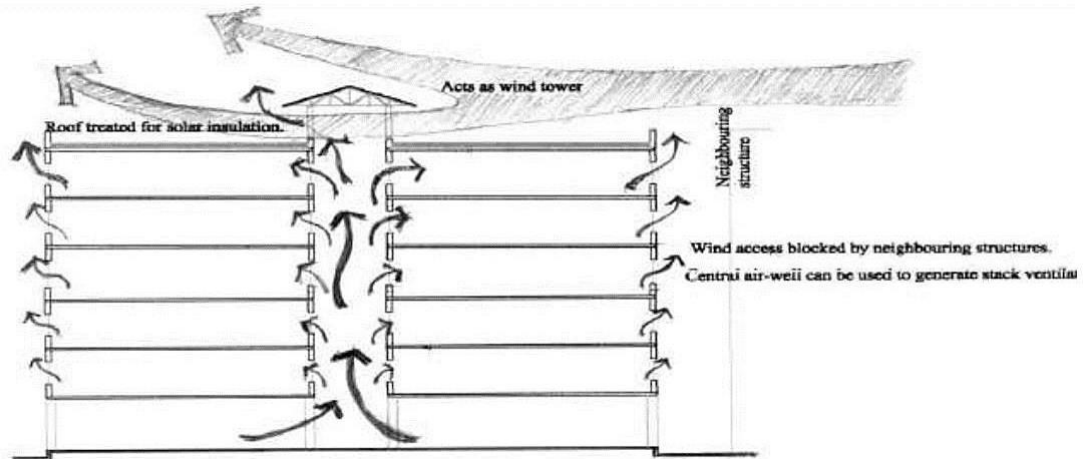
Roof with Insulation and Ventilated Attic Space to Allow Wind Access, (Ahmed, 2003)
